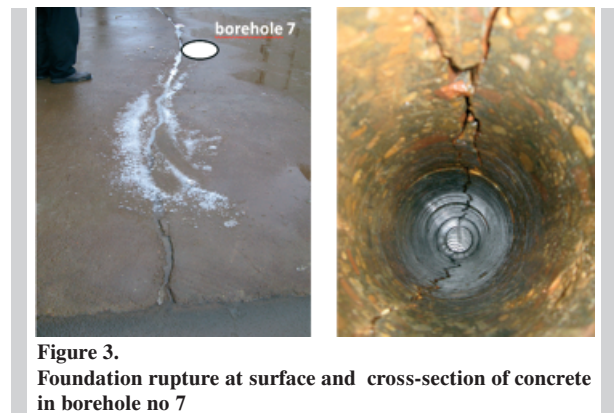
Foundation rupture at surface and cross-section of concrete in borehole no 7
